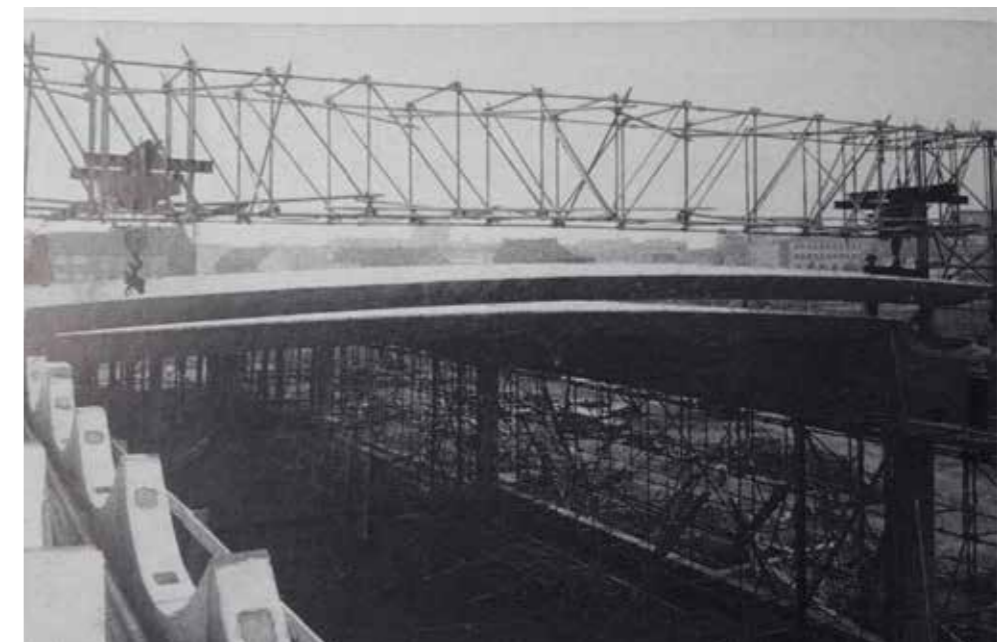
placing a shell in its frame Manual of Precast Concrete Constructions Vol. 1, p. 42
